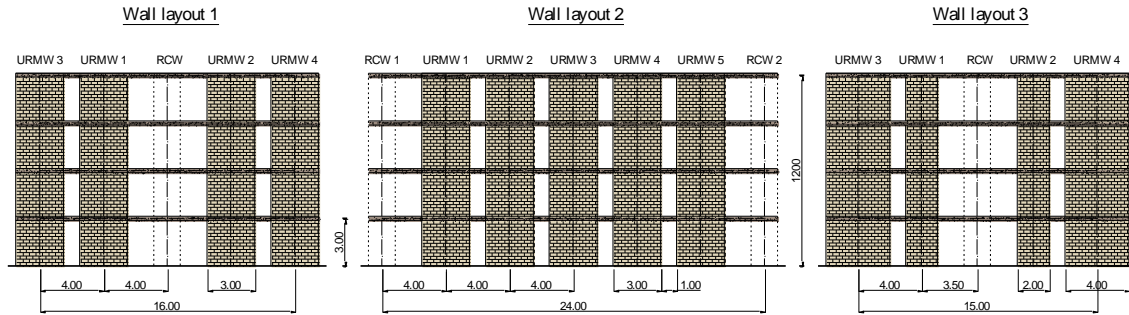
Elevation of the 4 storey buildings. All dimensions in m.
